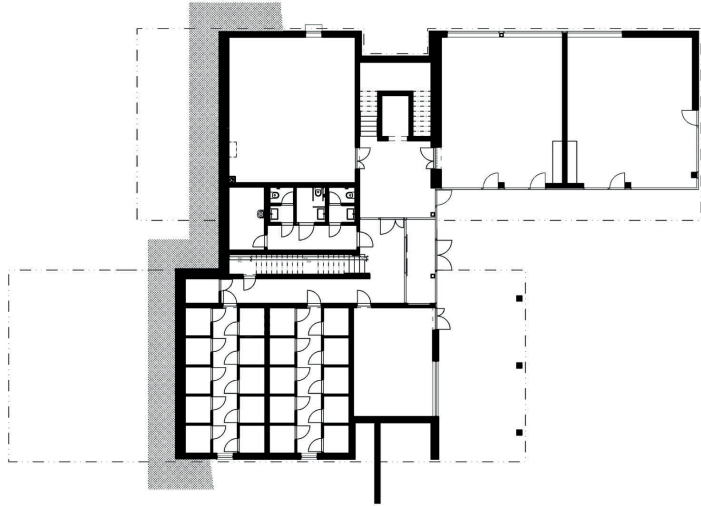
Apartment building for the elderly in Staříč, first floor plan, Kamil Mrva Architects
